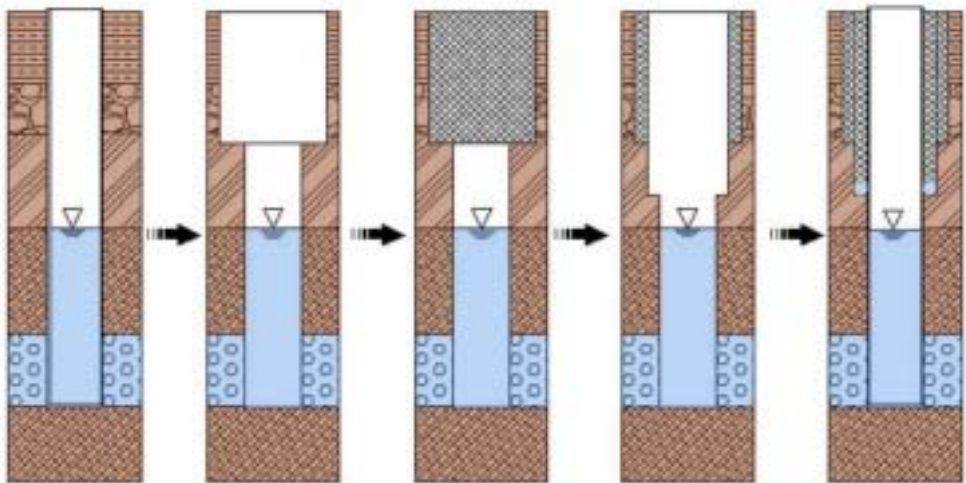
Diagram of expansive packer grouting(II) (a: before repairing, b: widening a well, c: filling-grouting d: reexcavation, e: grouting of surrounding gap)
